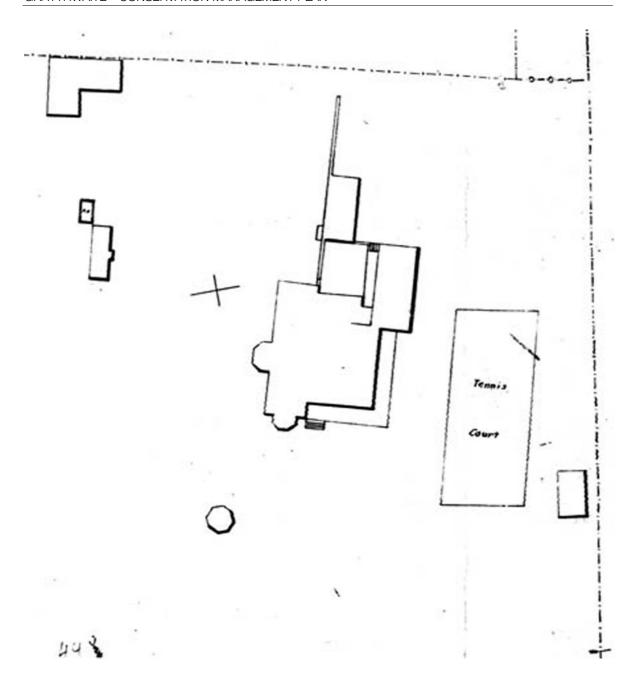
A survey undertaken of the property in 1891. Note the location of the gazebo to the south of the House and the outbuilding to the south of the Coach House (and west of the House). Source: Sydney Water—PWD 859.1544 (North Sydney Sheet No. 24).
